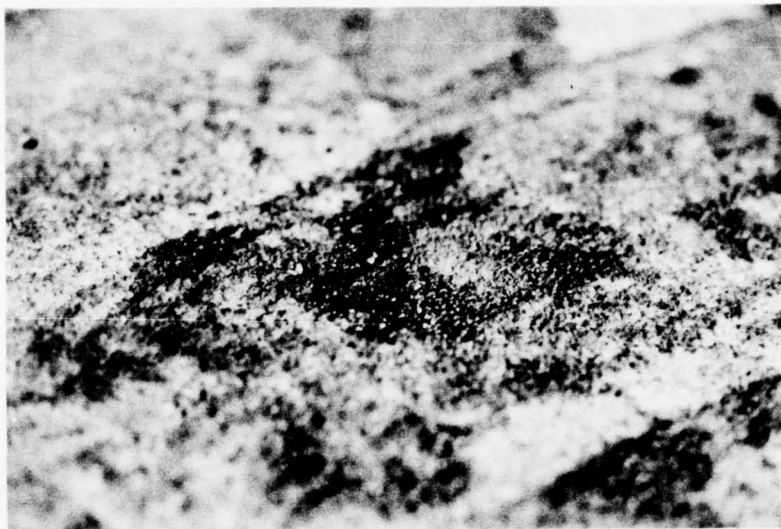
Detail of beam used in the second investigation showing moisture on the surface of the concrete
